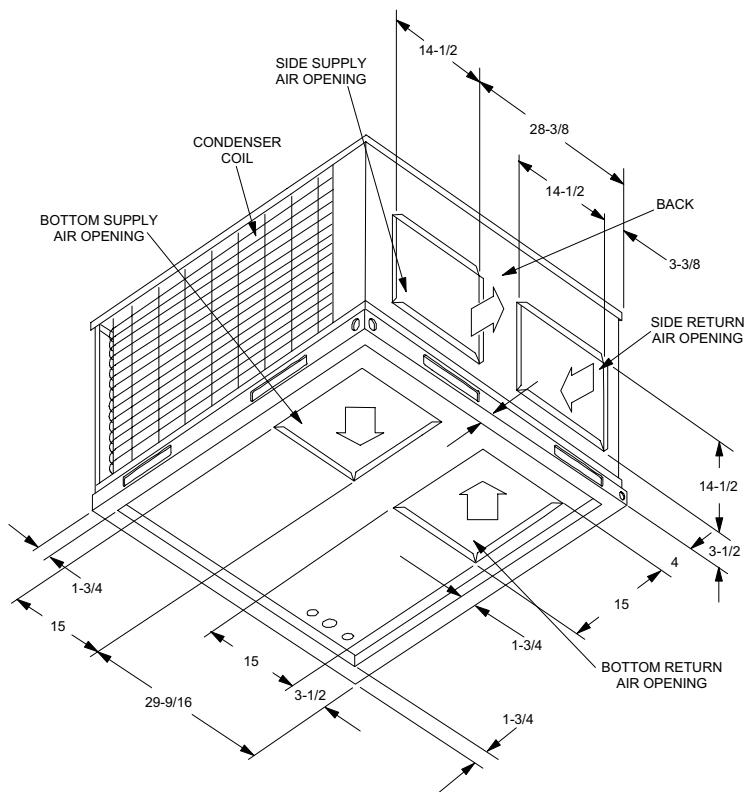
UNIT DIMENSIONS - FRONTTABLE 17: UNIT DIMENSIONS FRONT
